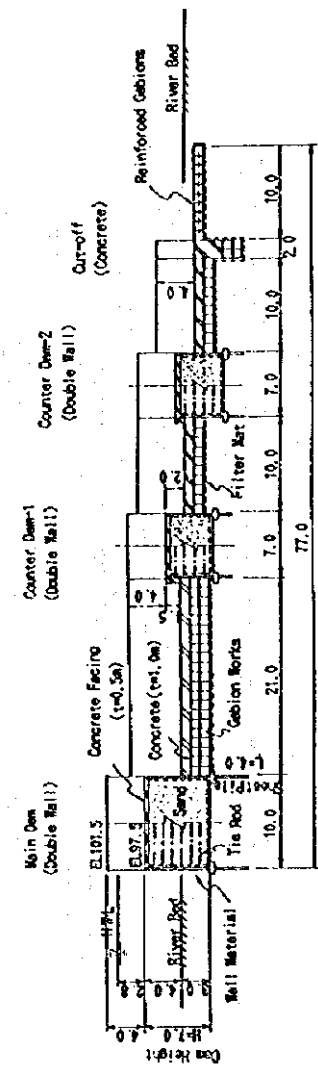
Preliminary Plan of Dolores Consolidation Dam
